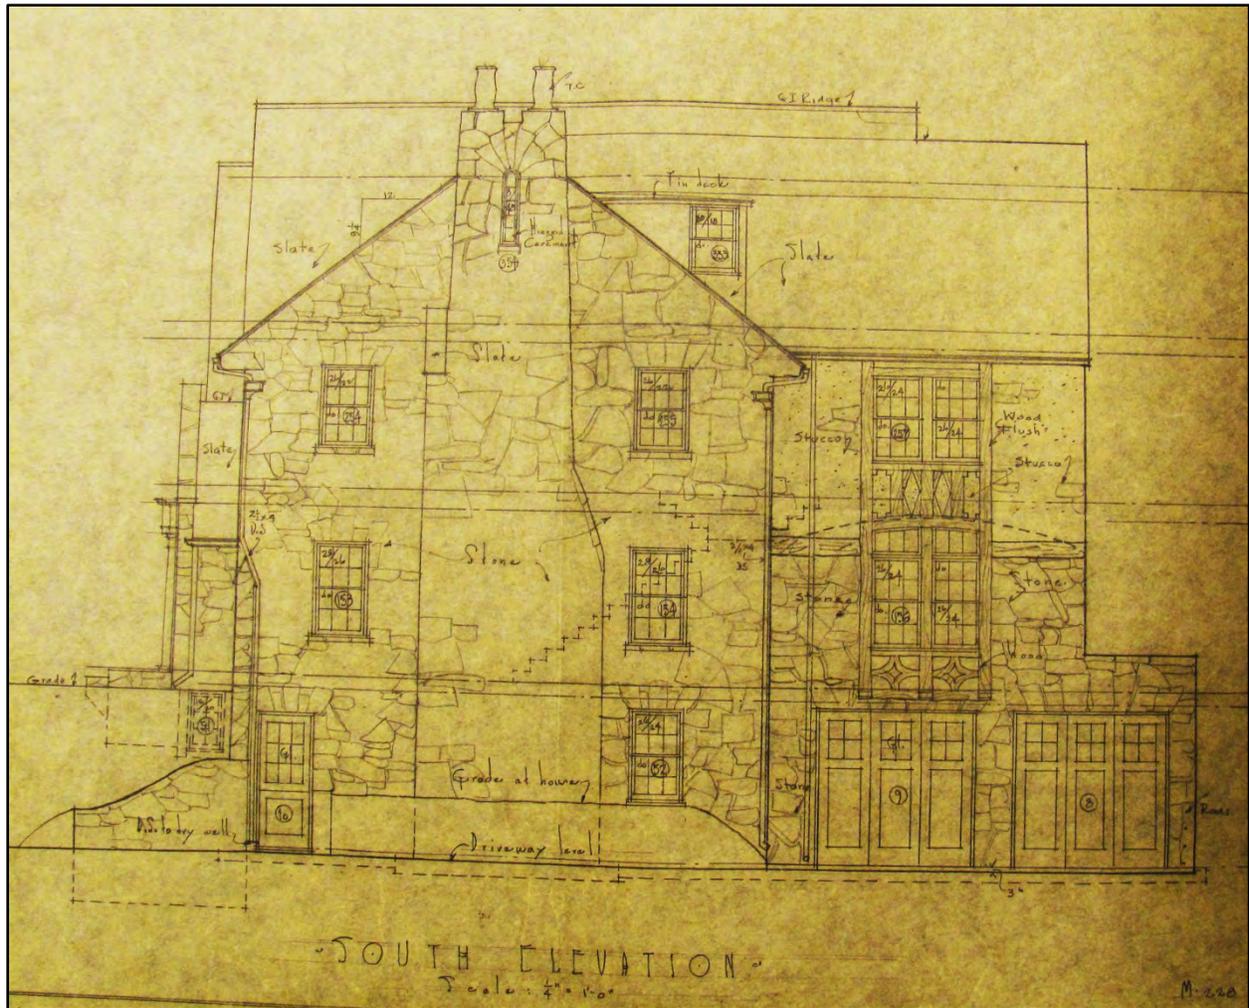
Amos Samuel Deinard Residence, 1729 Morgan Avenue South South (side) elevation plan, scanned by Robert Glancy May 2011, source: "Liebenberg and Kaplan Papers 1919-1969," Northwest Architectural Archives, University of Minnesota
